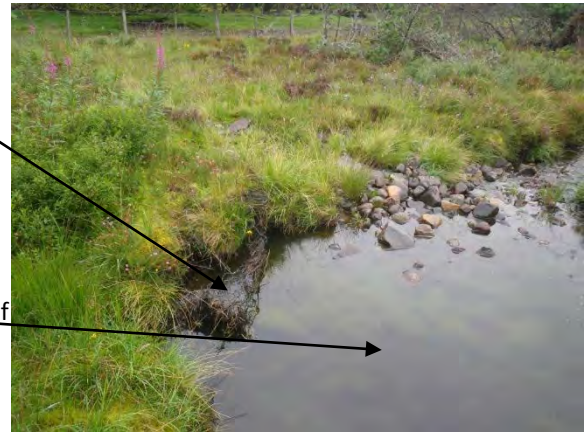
Crossing exit- Over wide, shallow channel
